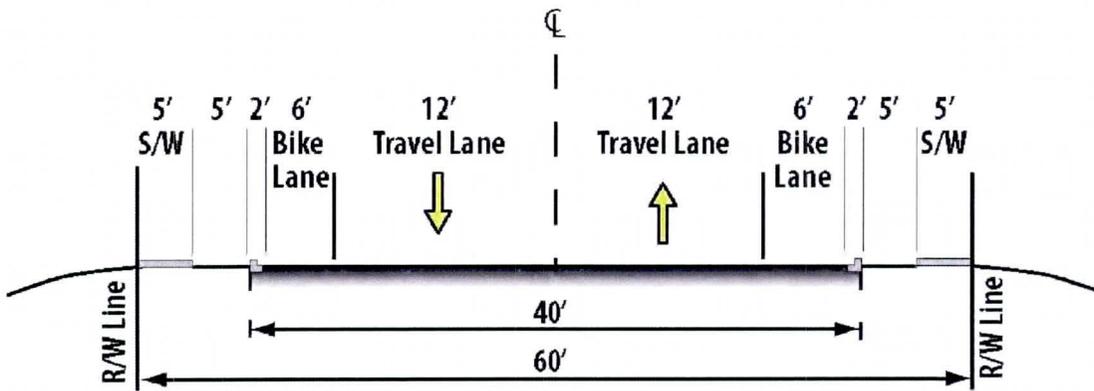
Ultimate Roadway Cross Section – Lost Dutchman Boulevard to McDowell Boulevard
